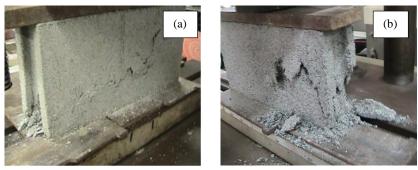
Concrete hollow blocks at failure: (a) 0% replacement, (b) 30% replacement.
